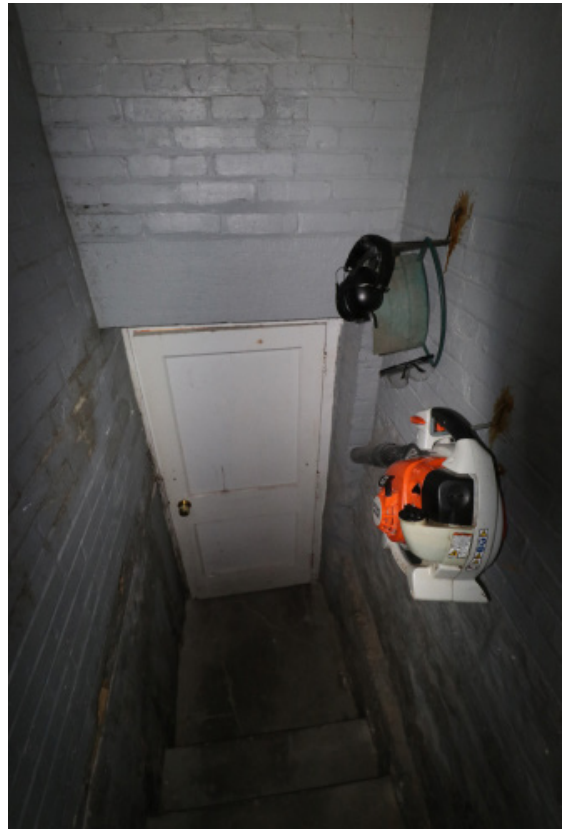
D-194 Painted wood door at the entry to the north elevation exit stair.
